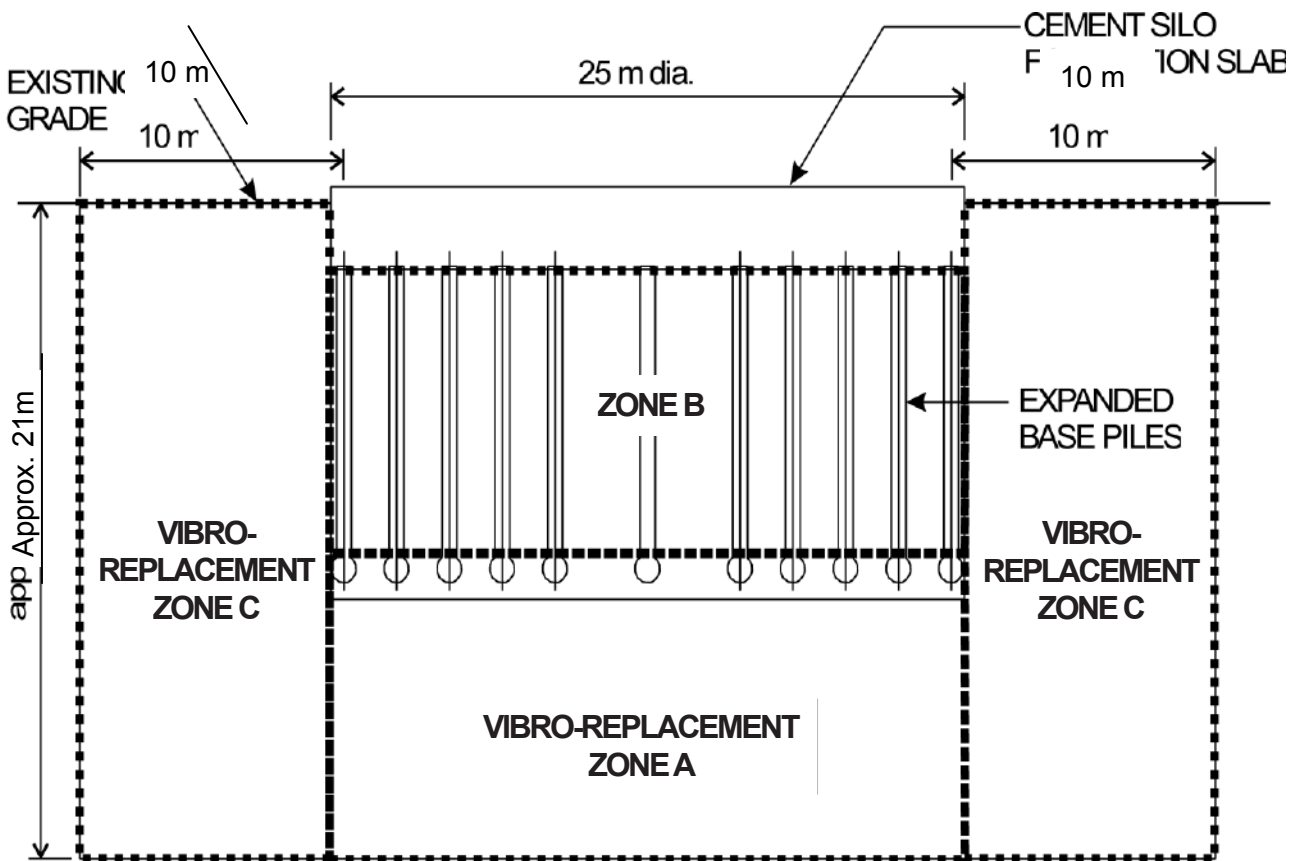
Foundation system - cement silo – Section Z--Z (see Fig. 6-1 for section location).
